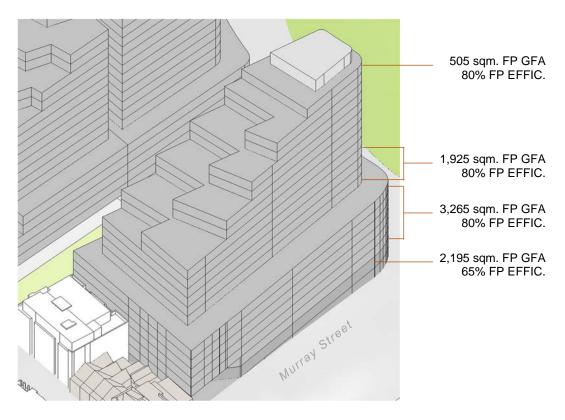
floorplate diagram for 1-27 Murray Street showing alternative non-residential controls
